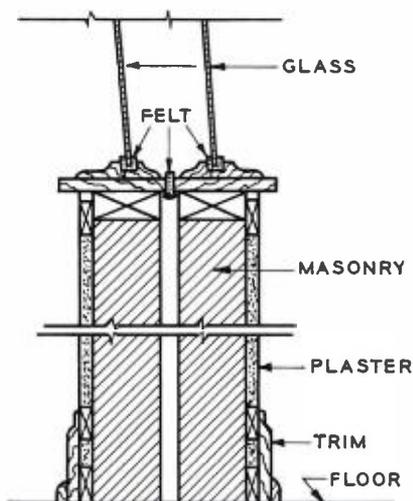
Sound-insulating window construction showing structural separation of double wall. Glass windows in studios and control rooms should be offset about 10 degrees, and they should be mounted as shown on a double wall.
